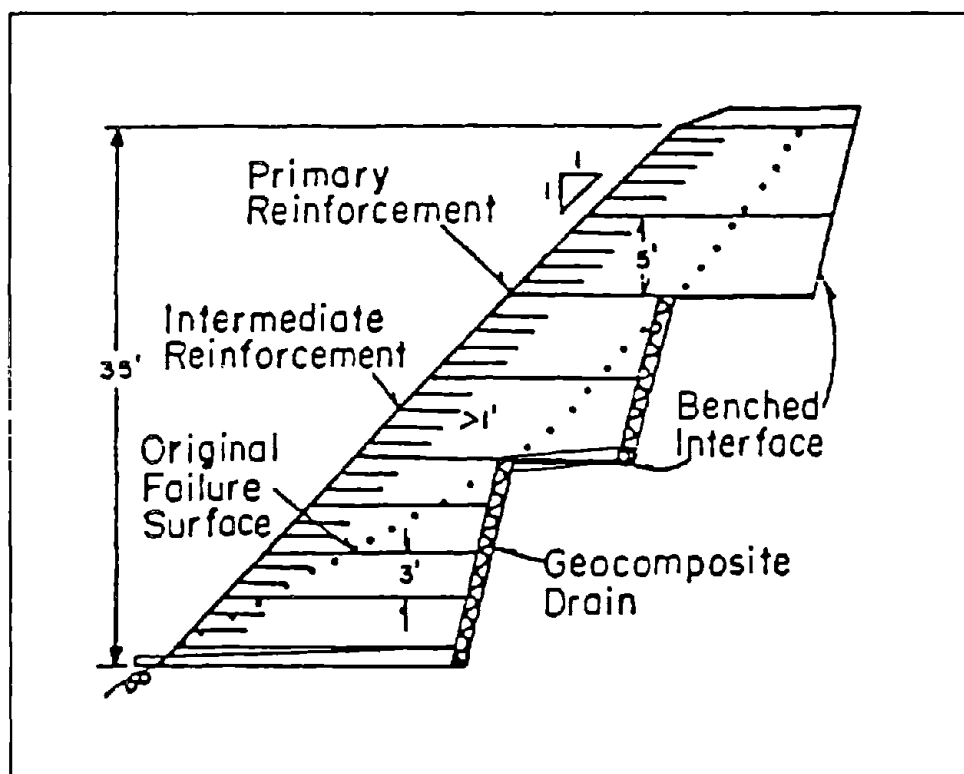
Reinforced fill cross-section with drainage and a bench fill-native soil interface to prevent sliding failure.
